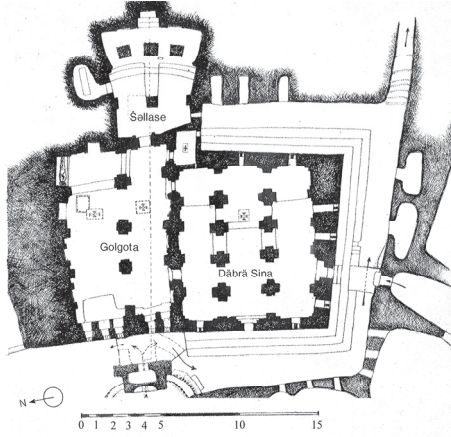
Churches of Däbrä Sina, Golgota, Šellase, in Lalibäla, Wällo, floor plans; after L. Bianchi Barriviera
